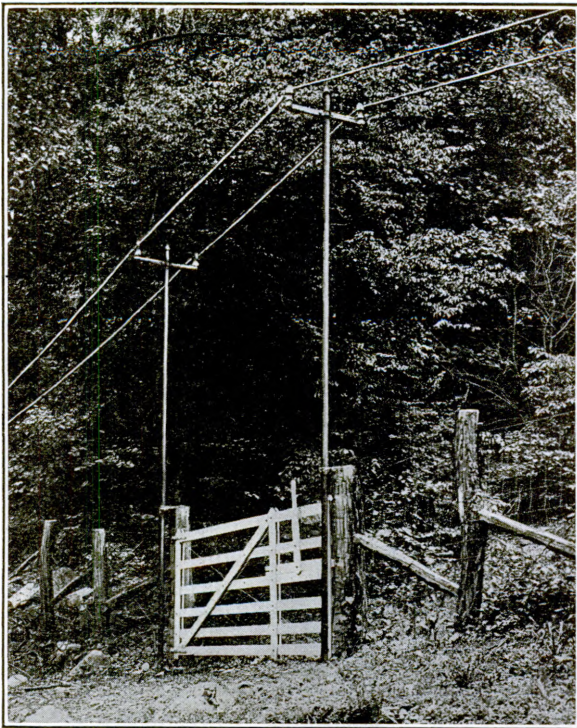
AERIAL LINE CONSTRUCTION, FENCE POST LINES, GATE CROSSING.
